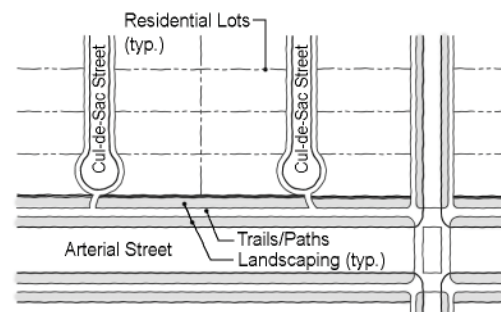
Lotting Conditions Adjacent to Major Roadways
